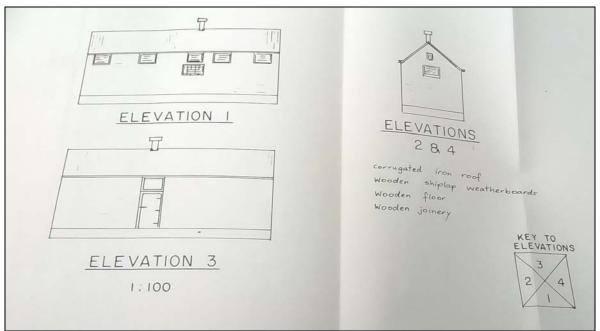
Elevation of the Lock-up from the building consent plans for relocation of the building. Project Information Memorandum (PIM) no. 012308 11/1995. 4 December 1995.
